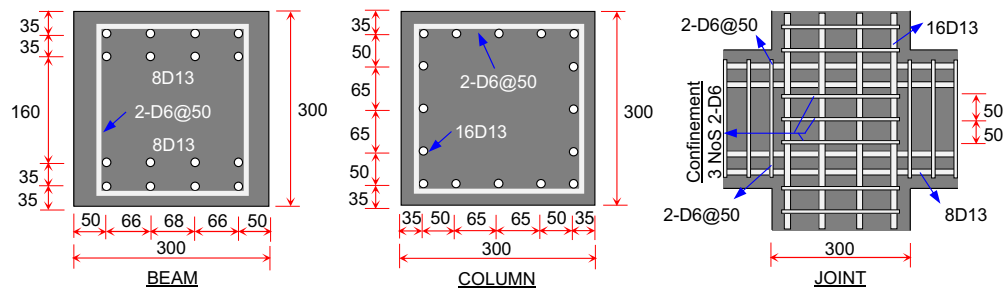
Schematic cross-section dimensions and bar layouts in specimen SK/A1 (adapted from [11]).
